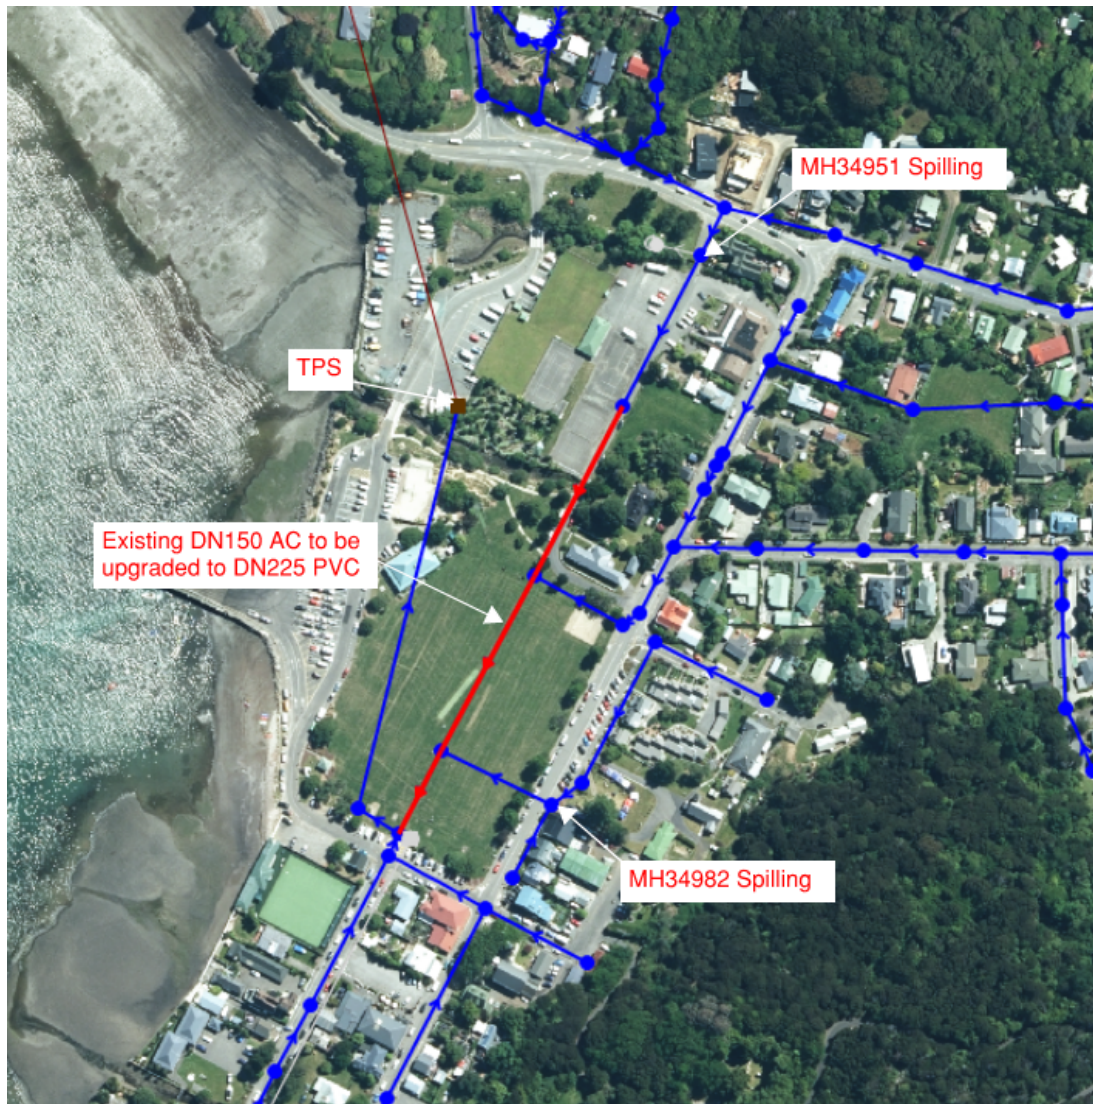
Spilling Manholes Without Additional Upgrades Recommended to Avoid Spilling.
